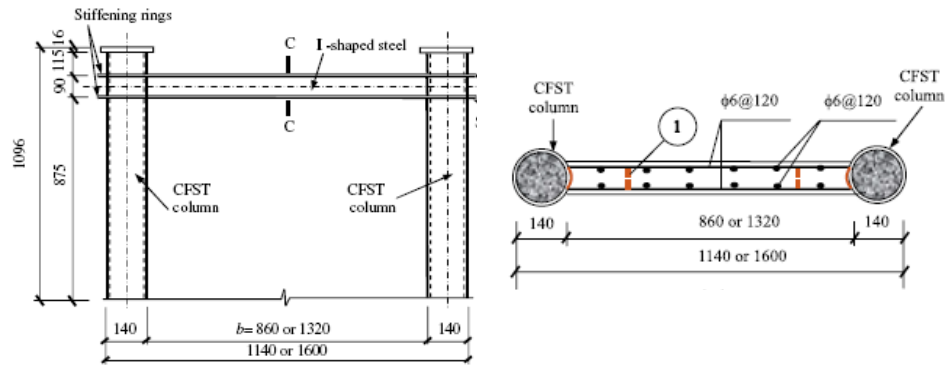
Wall specimens. Lin-Hai Han et. al.
